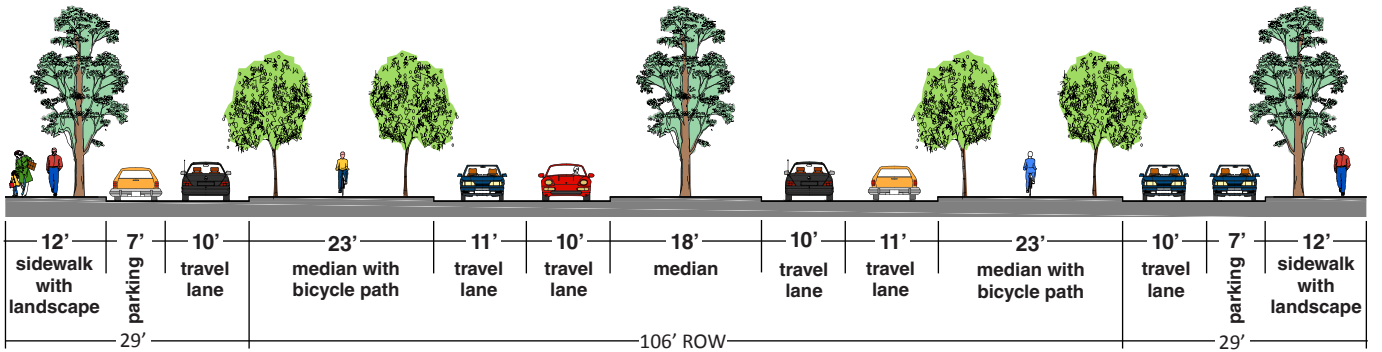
Eastside Parkway - Multiway Boulevard Street Section
